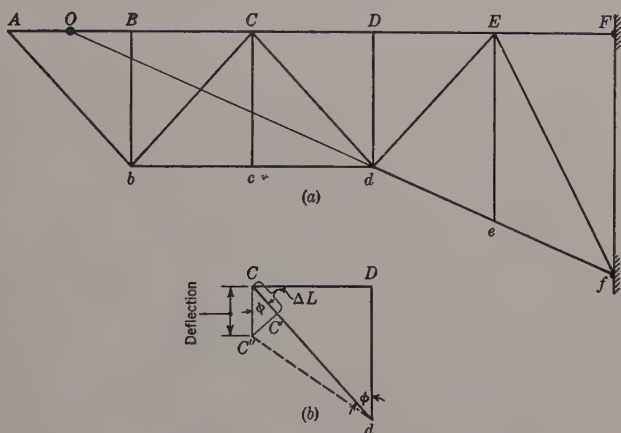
DEFLECTION OF A CANTILEVER TRUSS.
